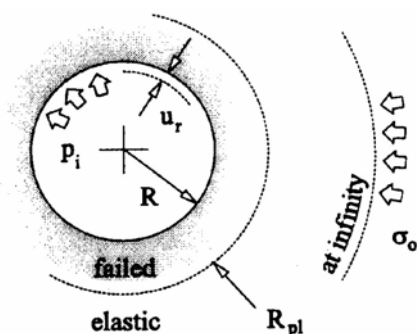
Cross-section of a cylindrical tunnel of radius R .
